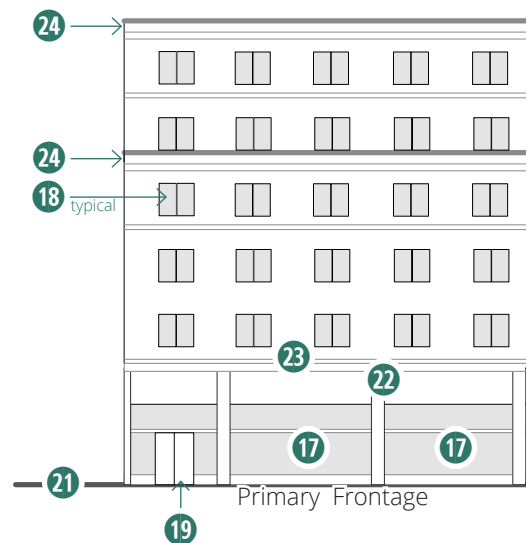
(9) Storefront Building Elevation: Facade Design Requirements
